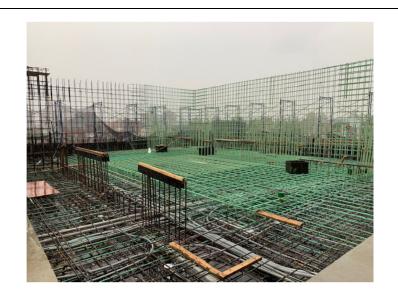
Facing northwest, StructureTech New York Inc. continues construction of columns and shear walls for the turbine hall foundation.
